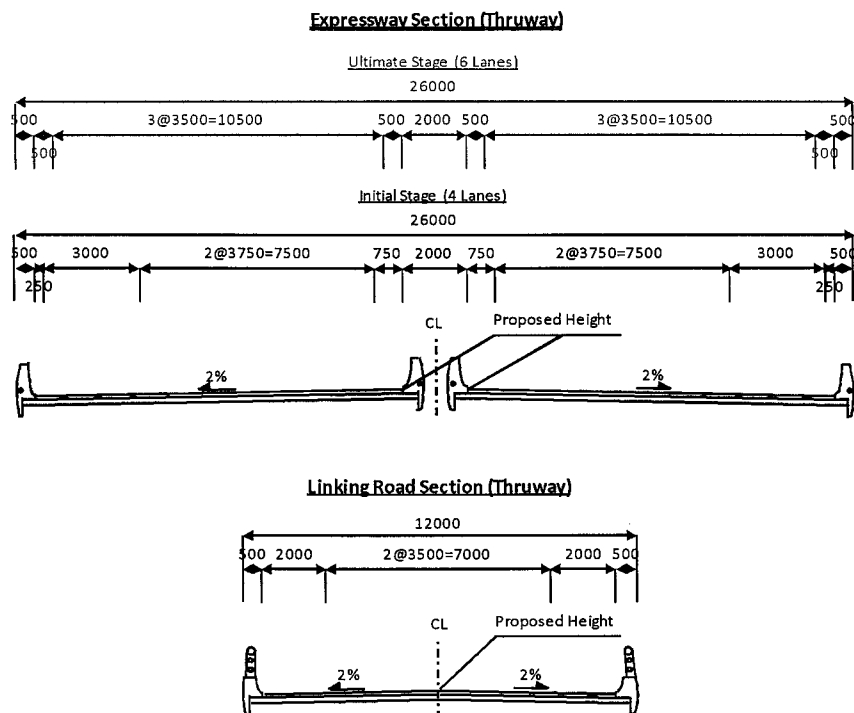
Cross Section Elements of Thruway Bridges in F/S Plan
